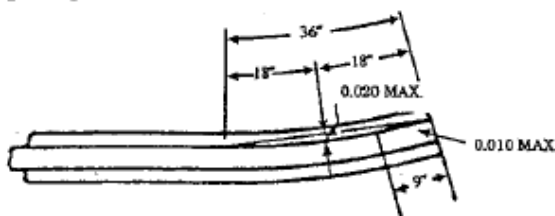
Top View of Rail Lateral (Horizontal) Line Tolerance at Rail Ends
